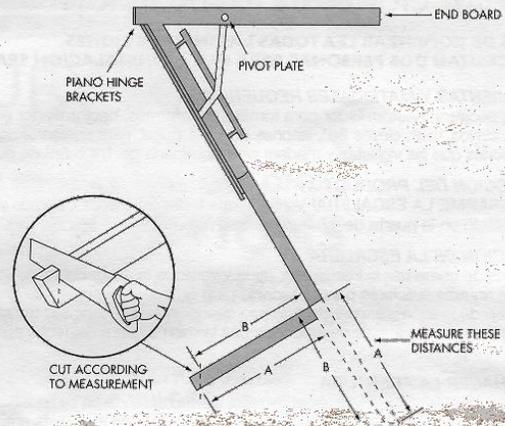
ADJUSTMENT TO CEILING HEIGHTS AND NAIL POSITIONS
